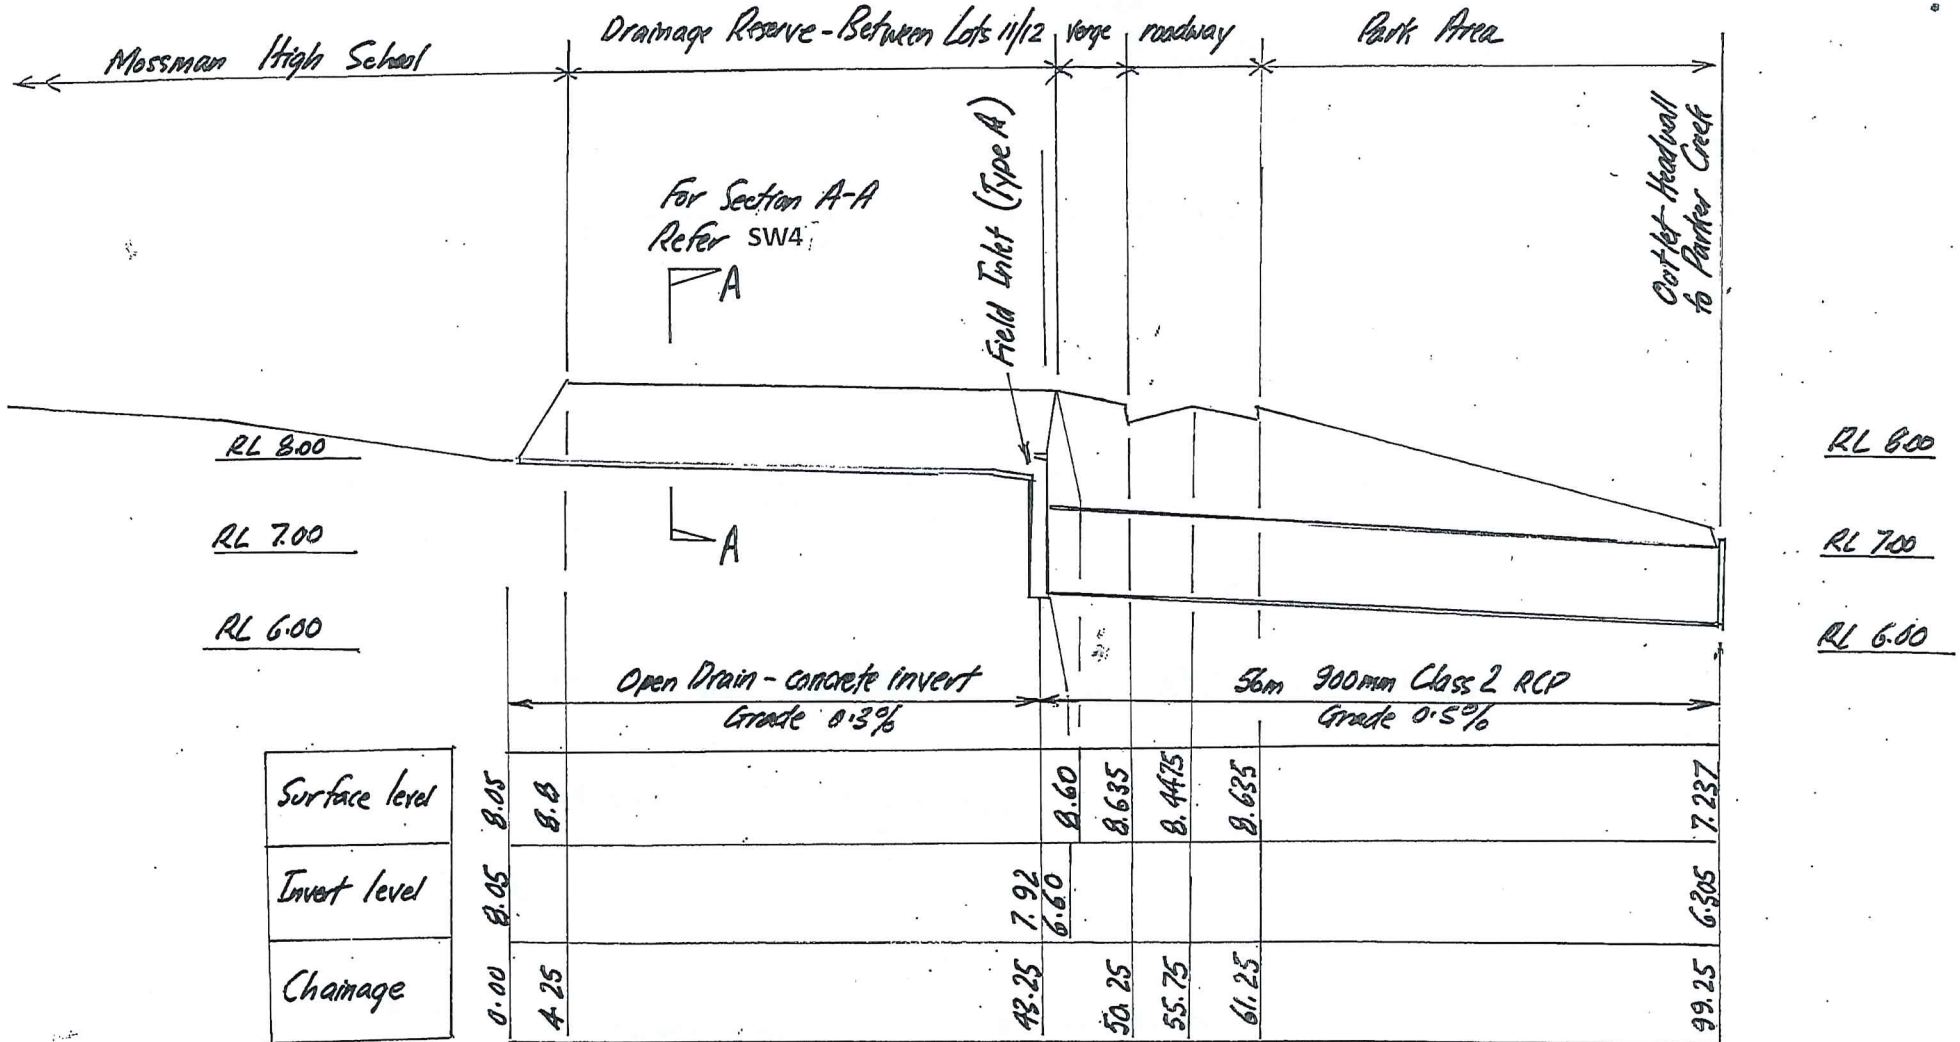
DETAIL MOSSMAN HIGH SCHOOL STORMWATER (DRAINAGE OPTION 2B)
